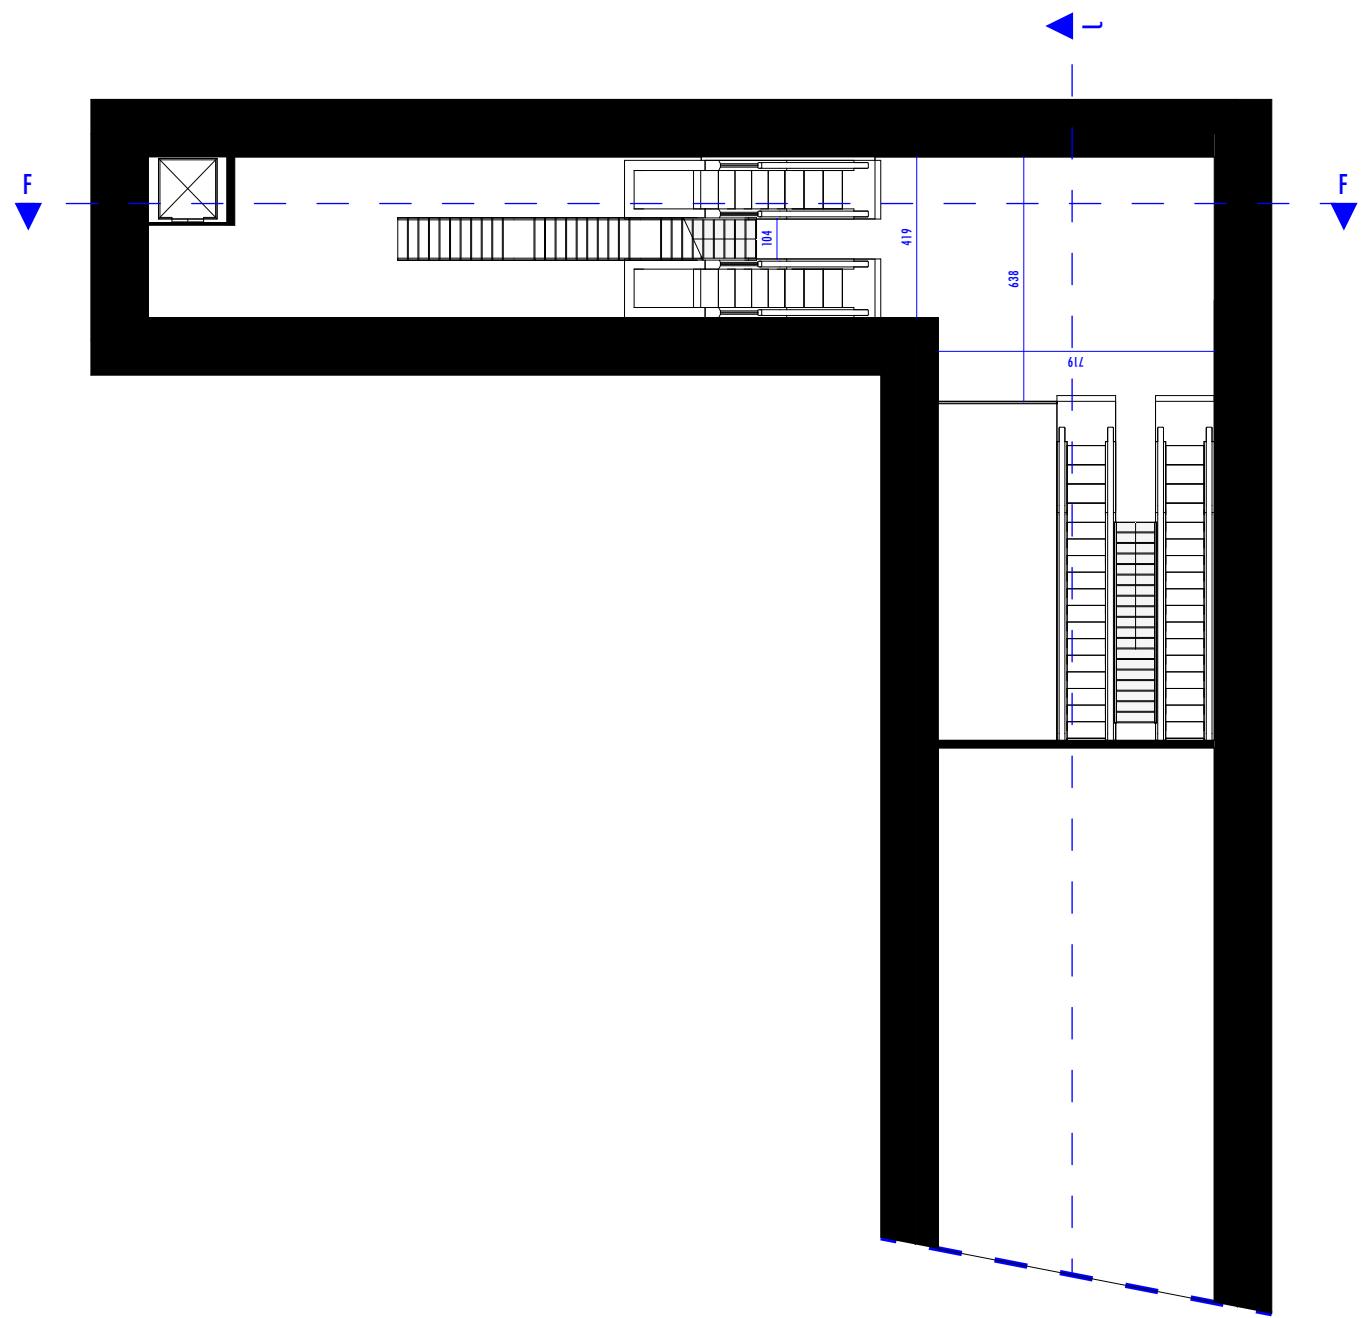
Mezzanine floor- Exit B to Honigmann House (-6.01m)
